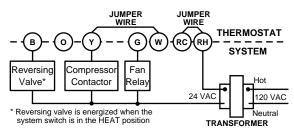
Typical wiring diagram for heat pump with heat active reversing valve
